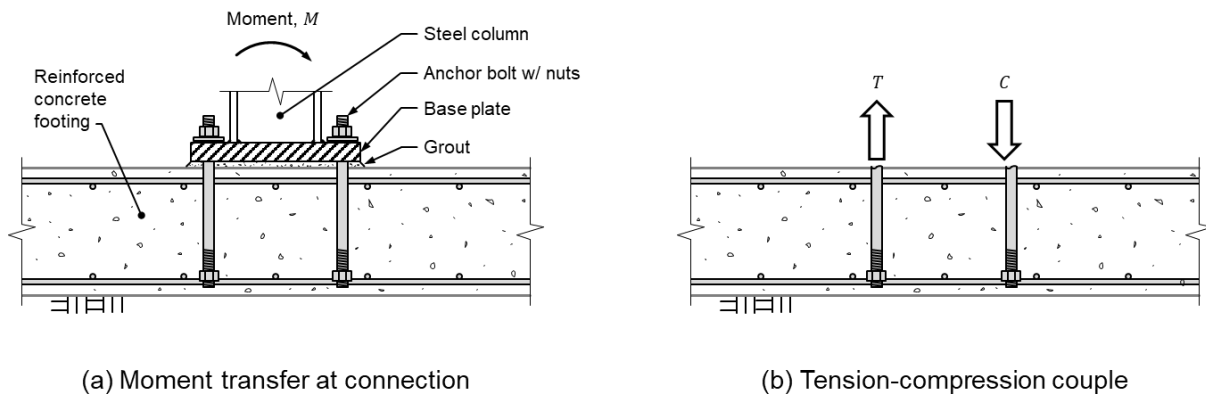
Moment transfer between a steel wide-flange column and a reinforced concrete foundation
